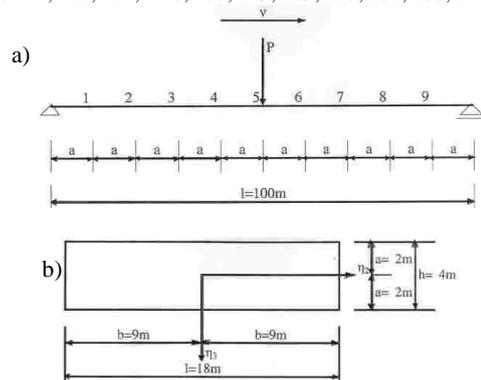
Scheme of bridge with moving load a), with bridge cross-section b).
